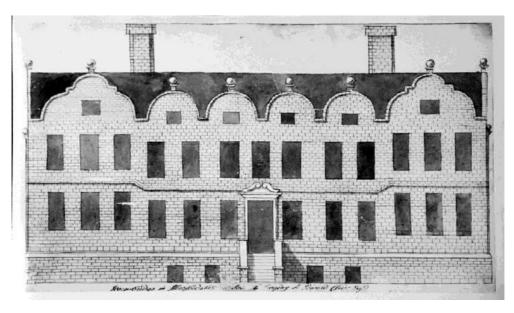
The south elevation of Wormbridge House in 1742. (British Museum)
